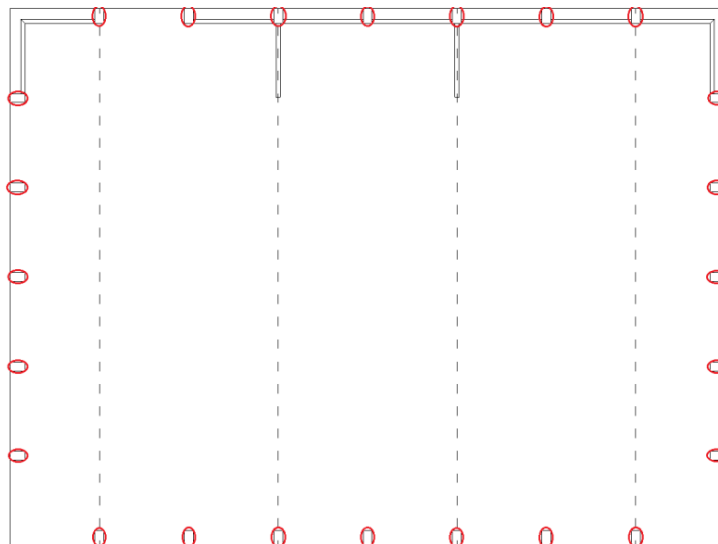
Location of columns that will be connected to floor and ceiling slabs
